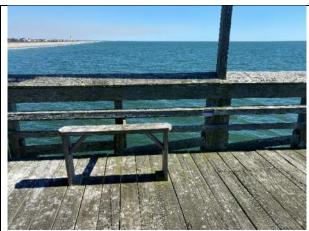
Typical Bench and Disconnected Toe Boards near station 6+75
